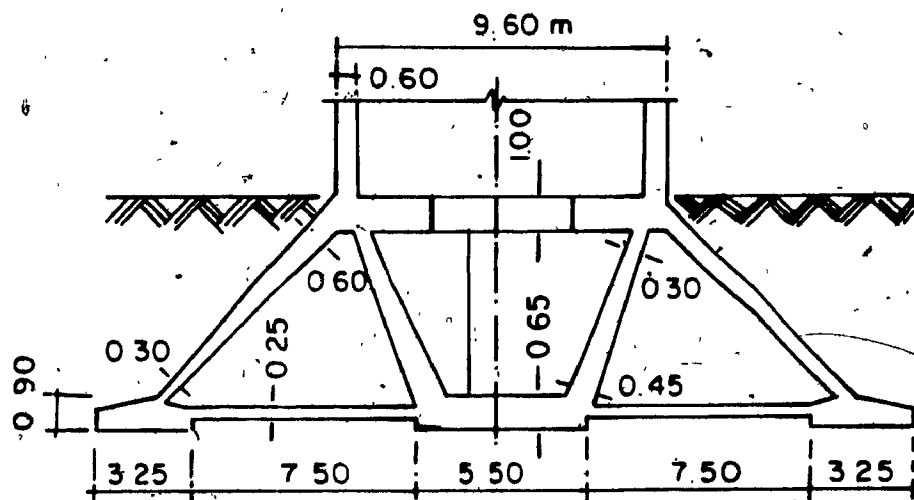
Shell Foundation of T.V. tower -Stuttgart, West Germany 1956
